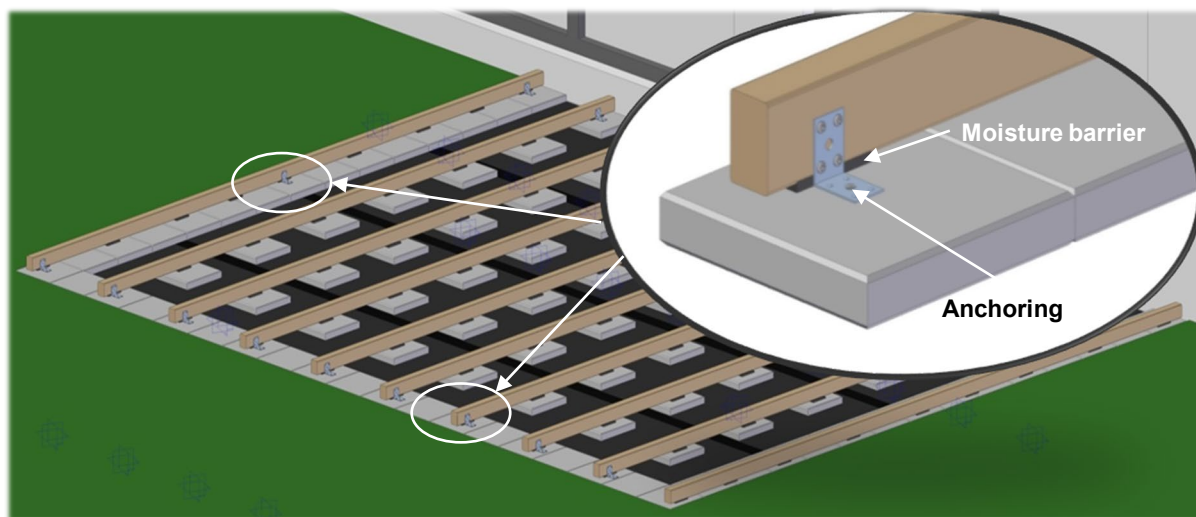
Example of beams at ground level. The beams are mounted on concrete slabs with EPDM spacers in between. This acts as a moisture barrier and raises the joists above the concrete slab, preventing moisture-wicking and allowing better drying of the wood. Angle brackets are used to anchor and stiffen the beams.
